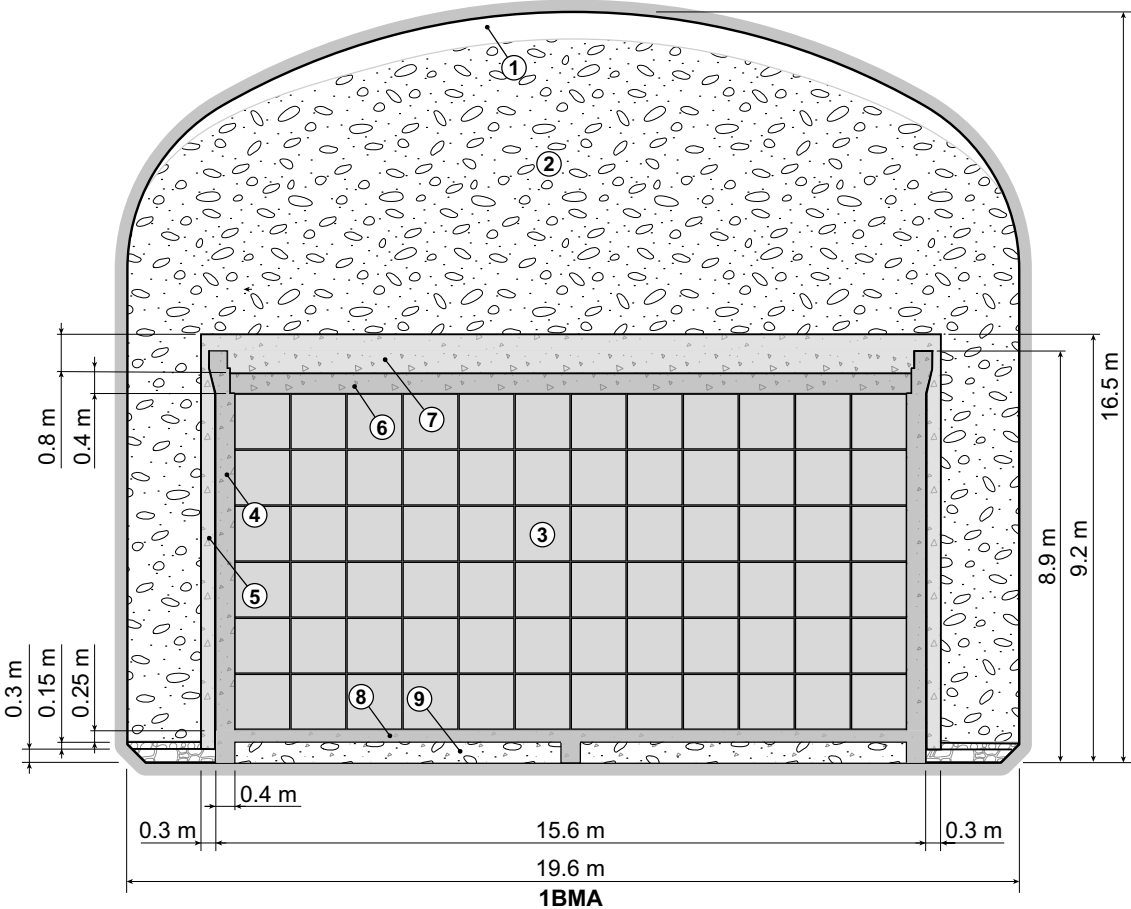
Schematic cross-section of 1BMA after closure. The dimensions of 1BMA are given in detail in Table 5-1. Key to numbering: 1) Void 2) Macadam backfill 3) Waste domain 4) Existing outer wall 5) New outer wall 6) Pre-fabricated concrete element 7) New concrete lid 8) Slab 9) Crushed rock.
